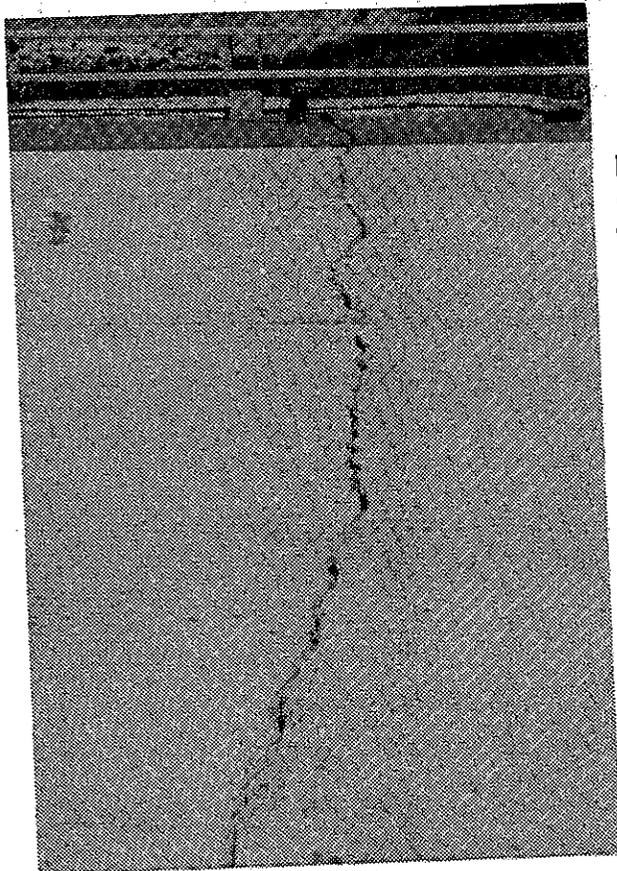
Transverse pavement crack at cut/fill contact near easterly approach to Bridge 53-1988 on the A-Y Connector.
